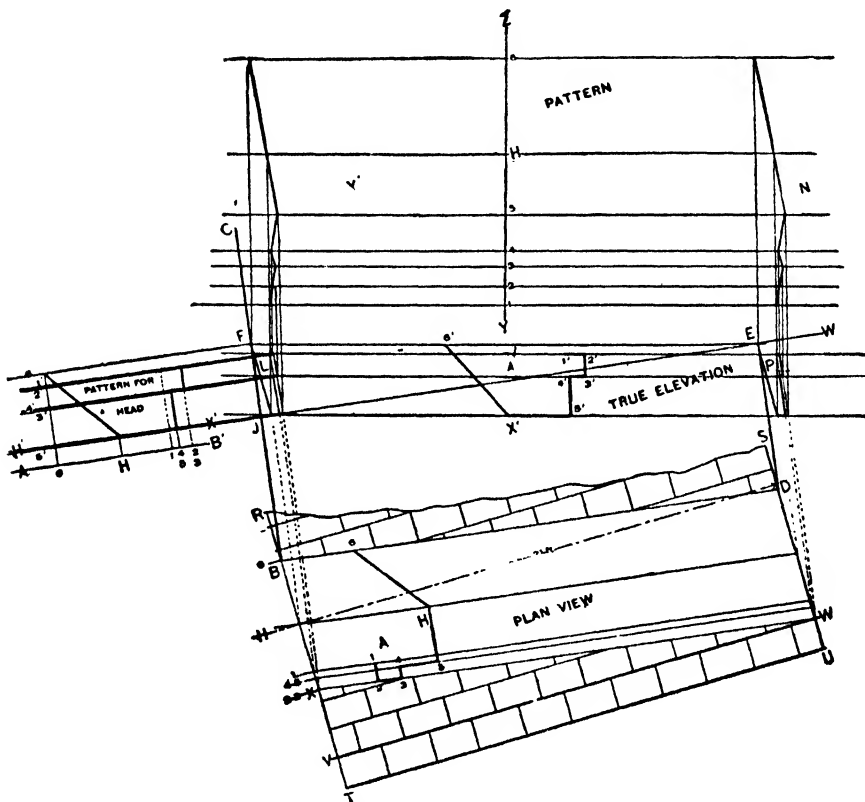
Plan View, True Elevation and Pattern of Roof Gutter
